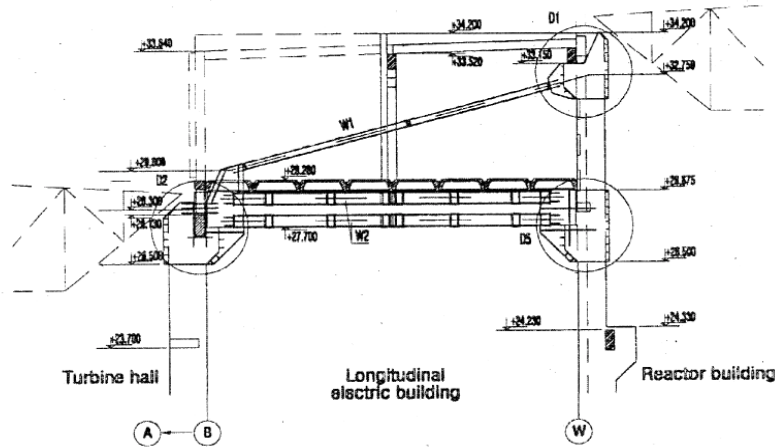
Detail: Upgrading of roof between turbine hall and reactor building
